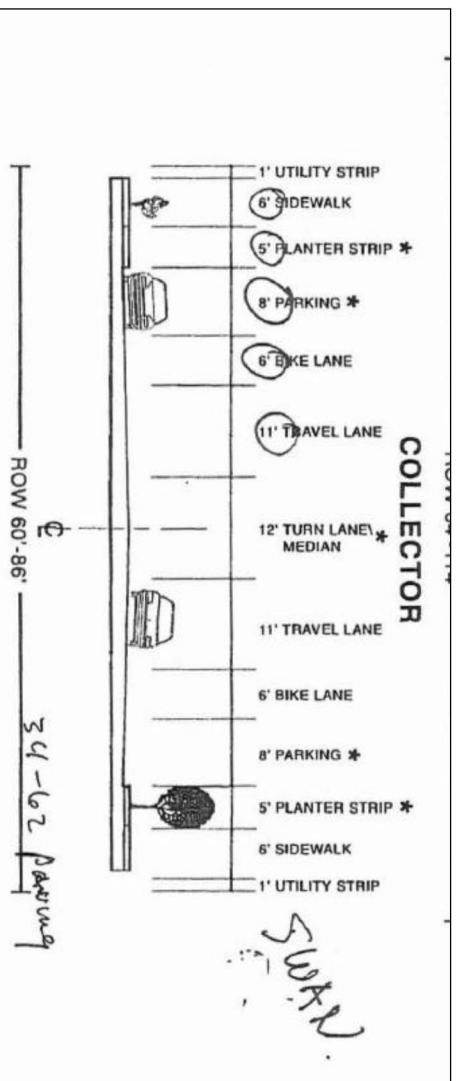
Annotated road section drawing for Swan Avenue from pre-application conference notes.
